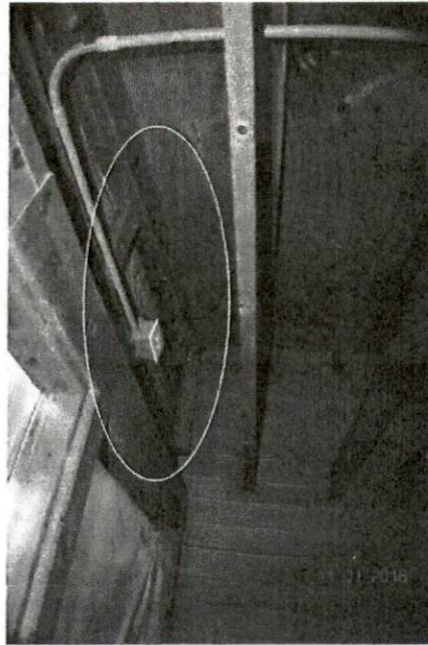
The left corner pier is damaged. Note the sill beam.
